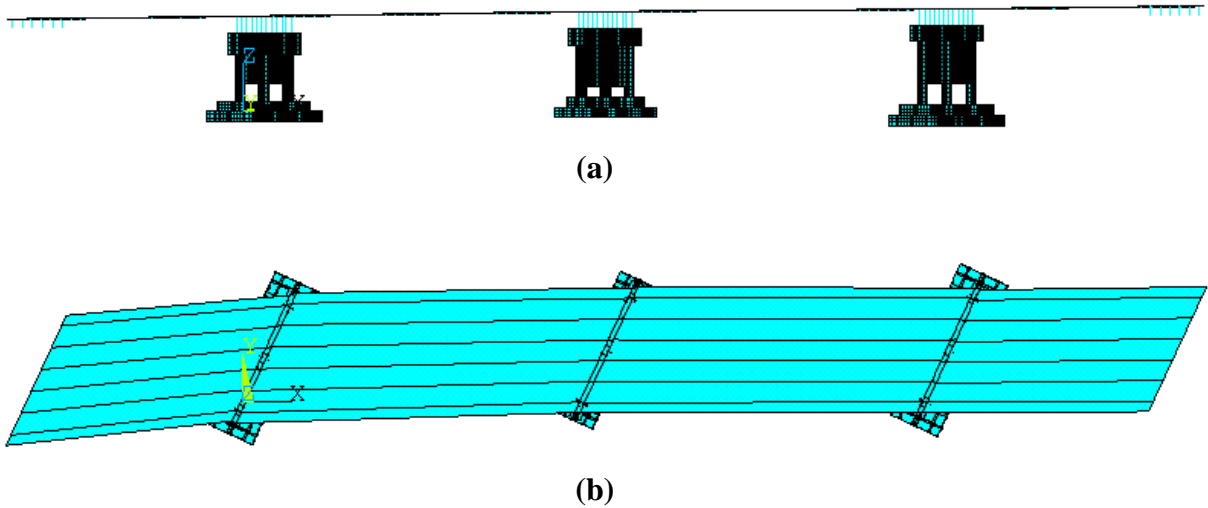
Spans and piers included in the FE model: (a) Elevation view; (b) Plan view.
